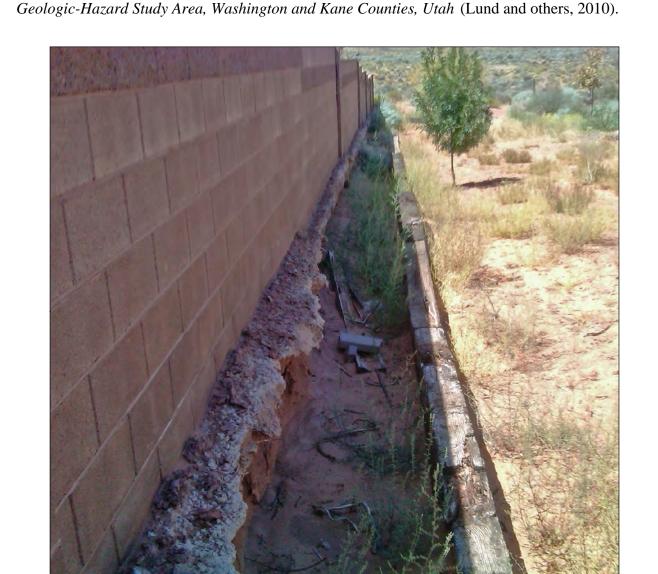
Exposed block wall foundation in Virgin due to wind erosion of sandy soil (photo credit
